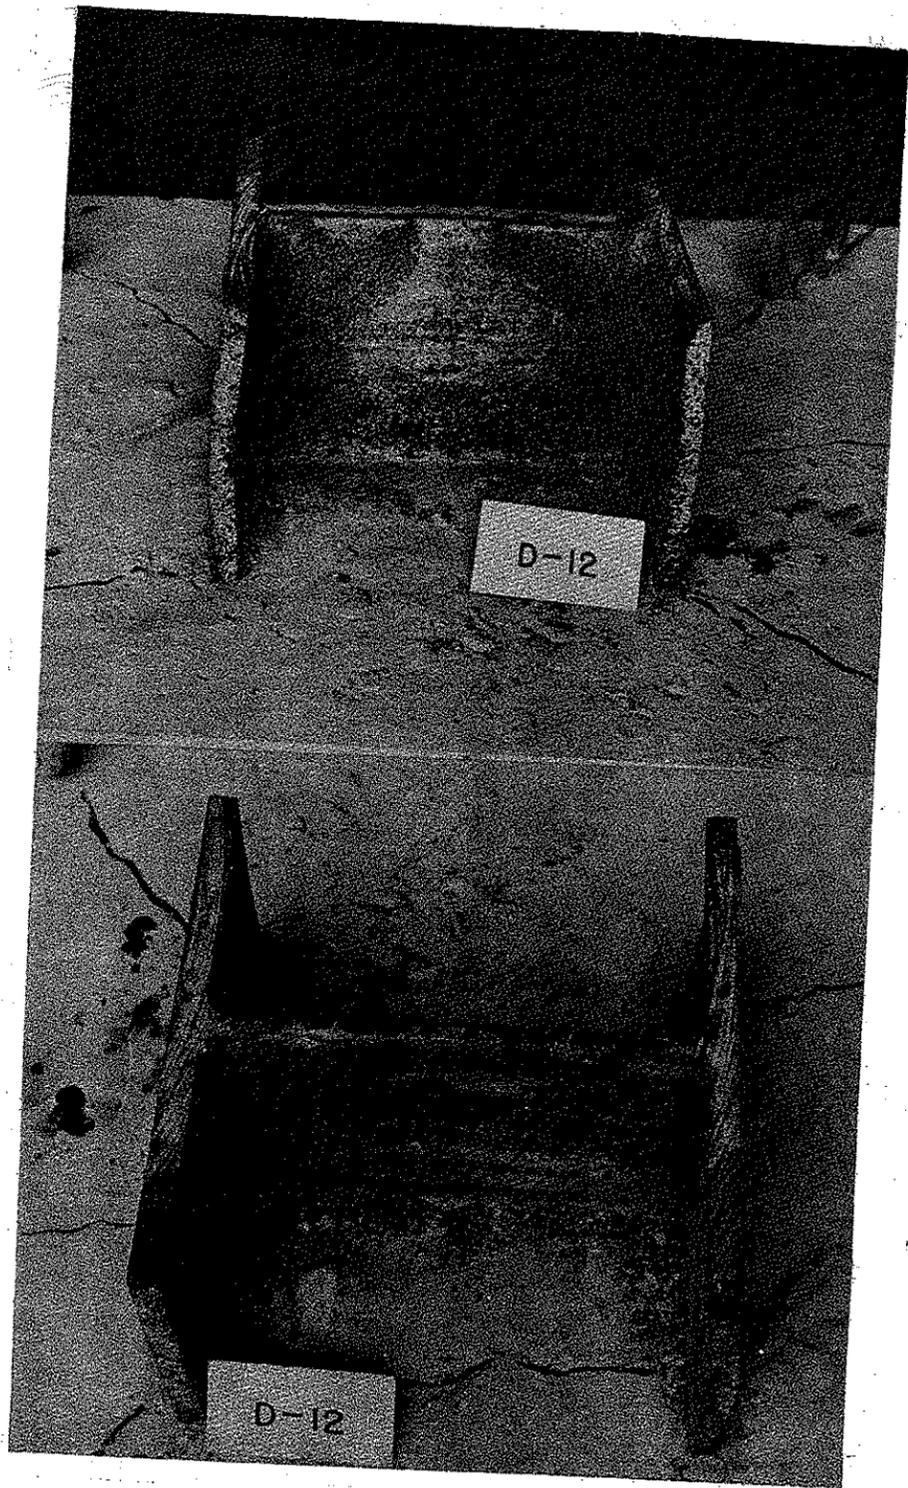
CLOSE-UP VIEW OF SPECIMEN D-12 AFTER TESTING.
